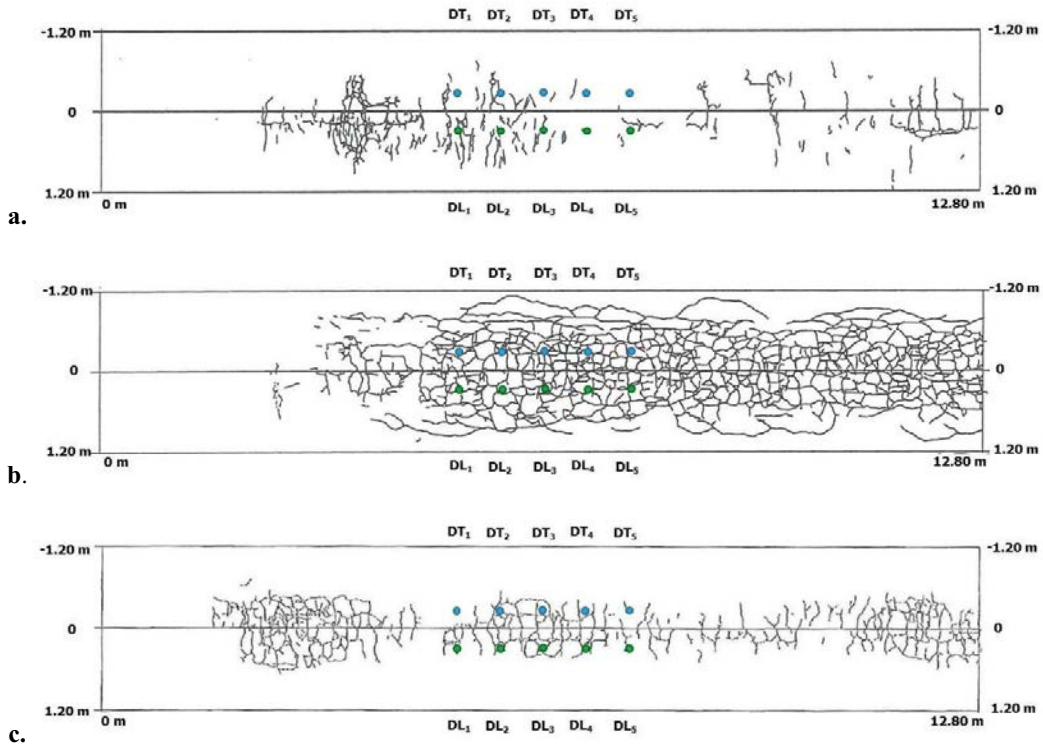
(a) Crack pattern of Lintrack section I after 4 Million cycles, wheel load 75 kN, 150 mm thickness. (b) section VA after 650 kilocycles, wheel load 75 kN, 80 mm thickness. (c) section VB after 1722 kilocycles, wheel load 50 kN, 80 mm thickness [1, 4]
